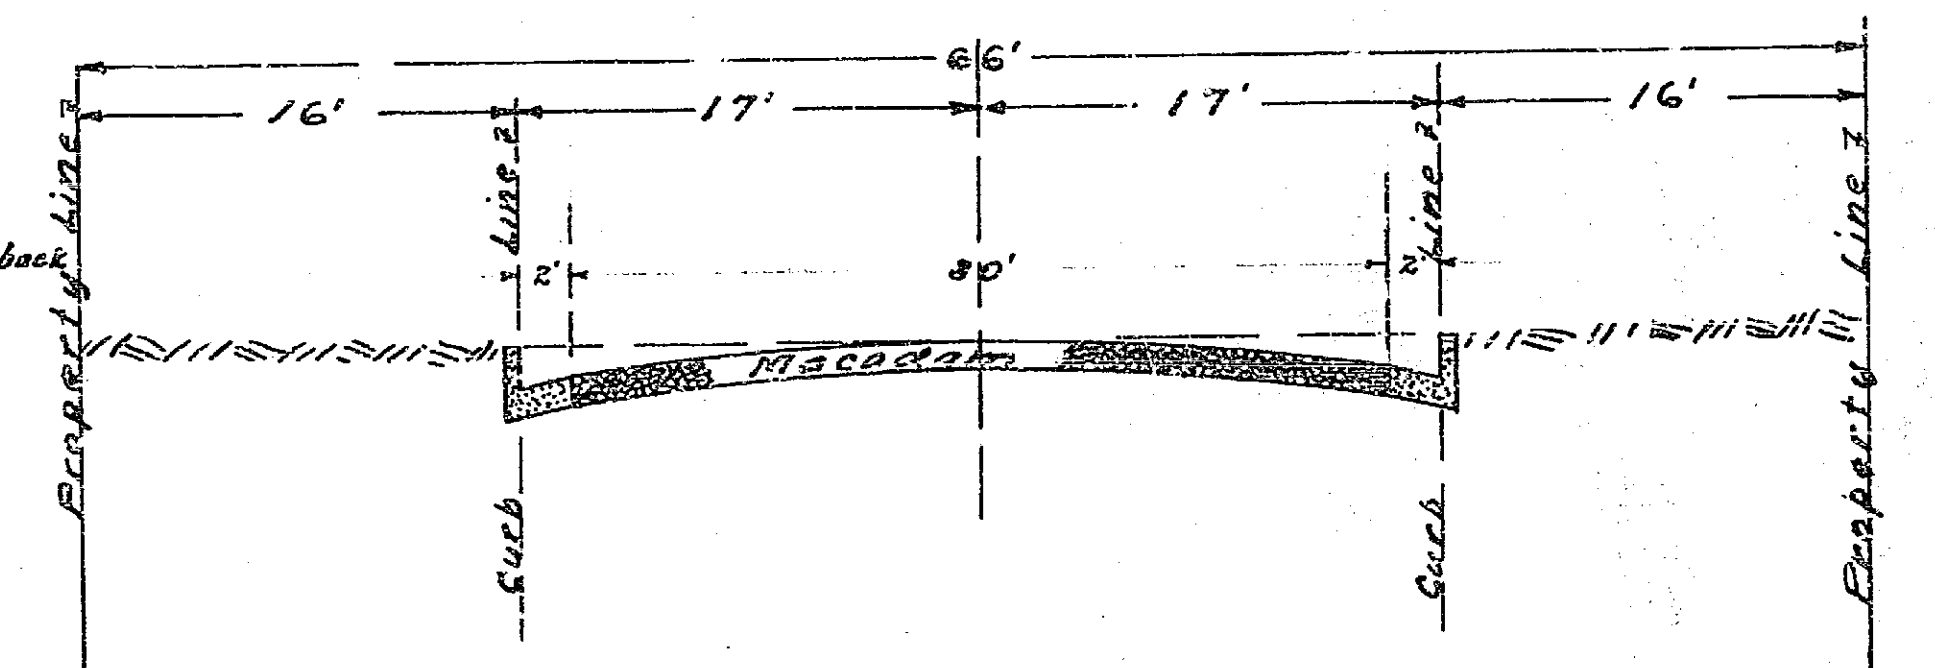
DETAIL OF CONSTRUCTION OF MACADAM ROADWAY
